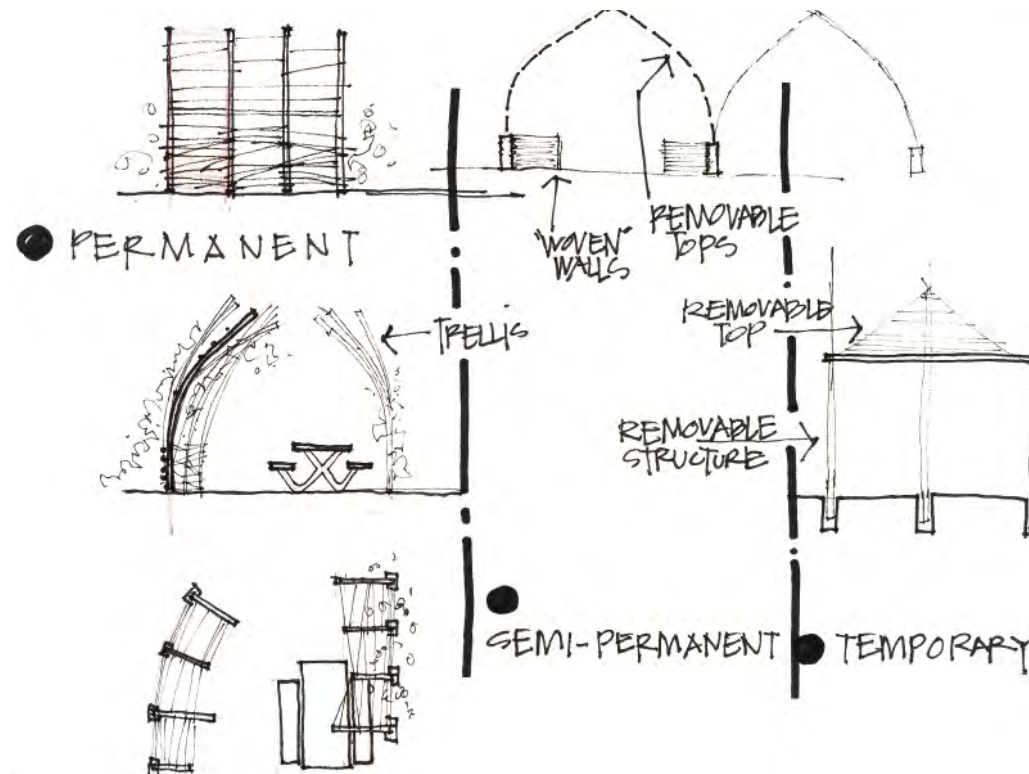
Seasonal and Removable Furnishings. Removable canopies and fencing will be used in the park.
